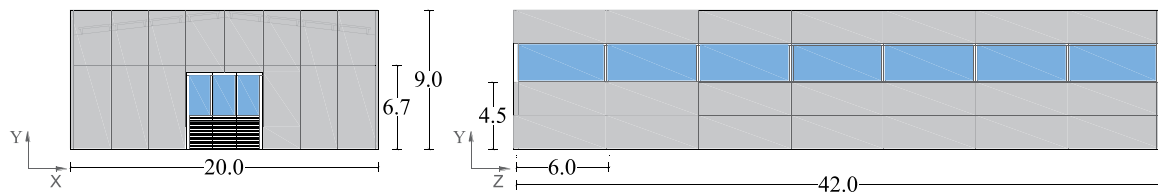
Building EE2 – frontal and side view. (Units: m).
